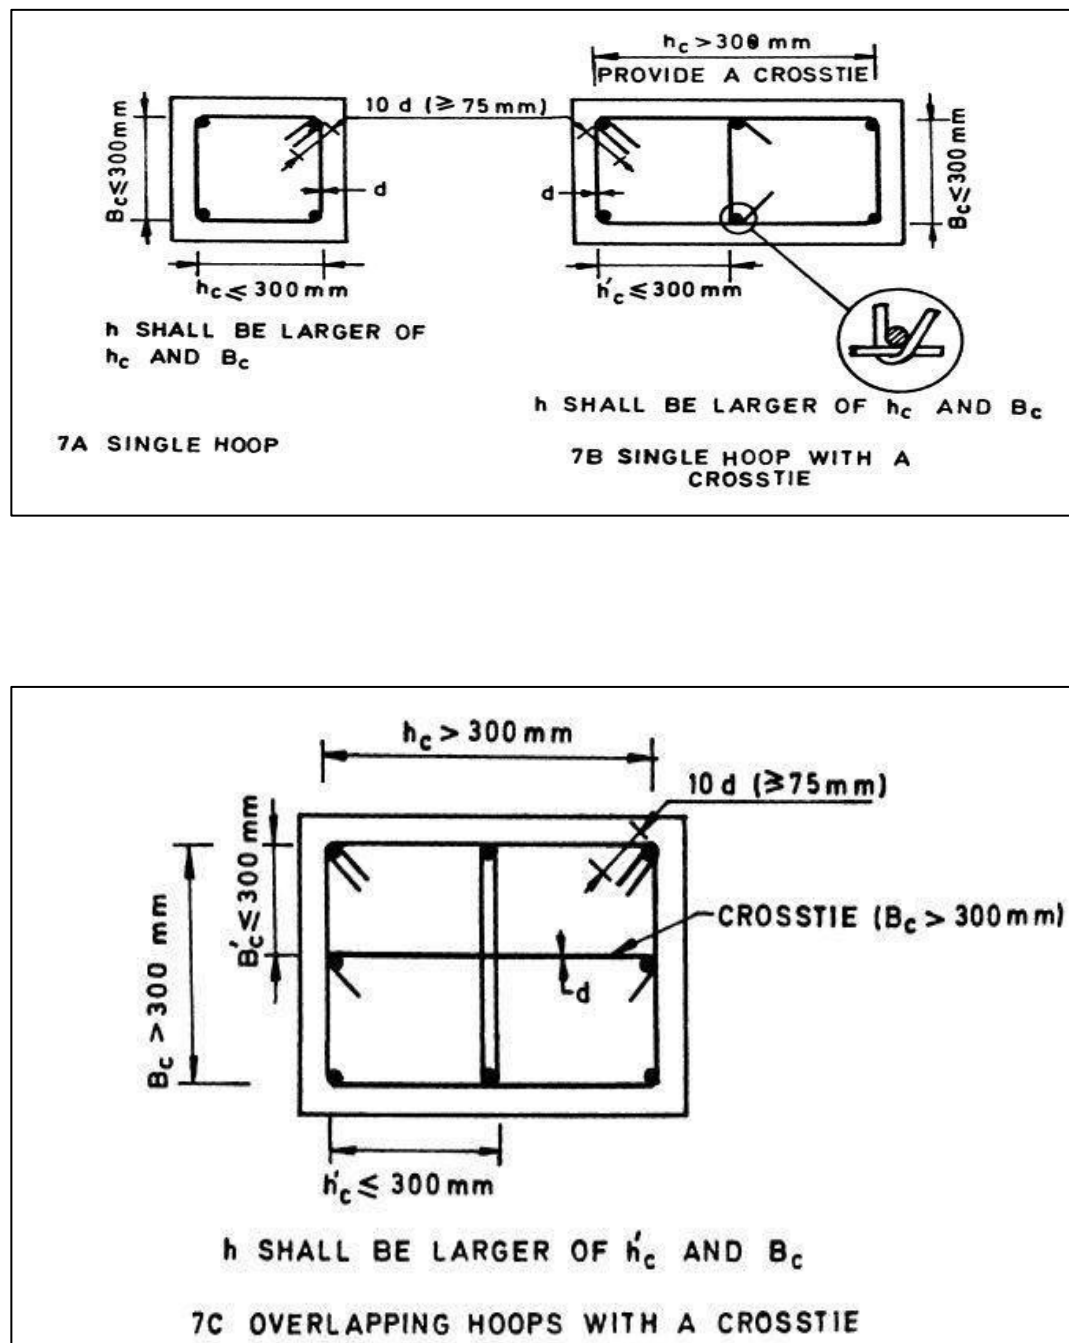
Transverse Reinforcement in columns as per IS 13920(2016)
